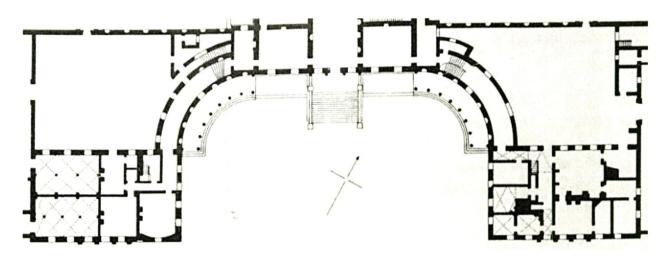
detail of colonnades, wings and their private gardens by John Steward, 1967 curtesy of Irish Houses and Castles (London 1971)
